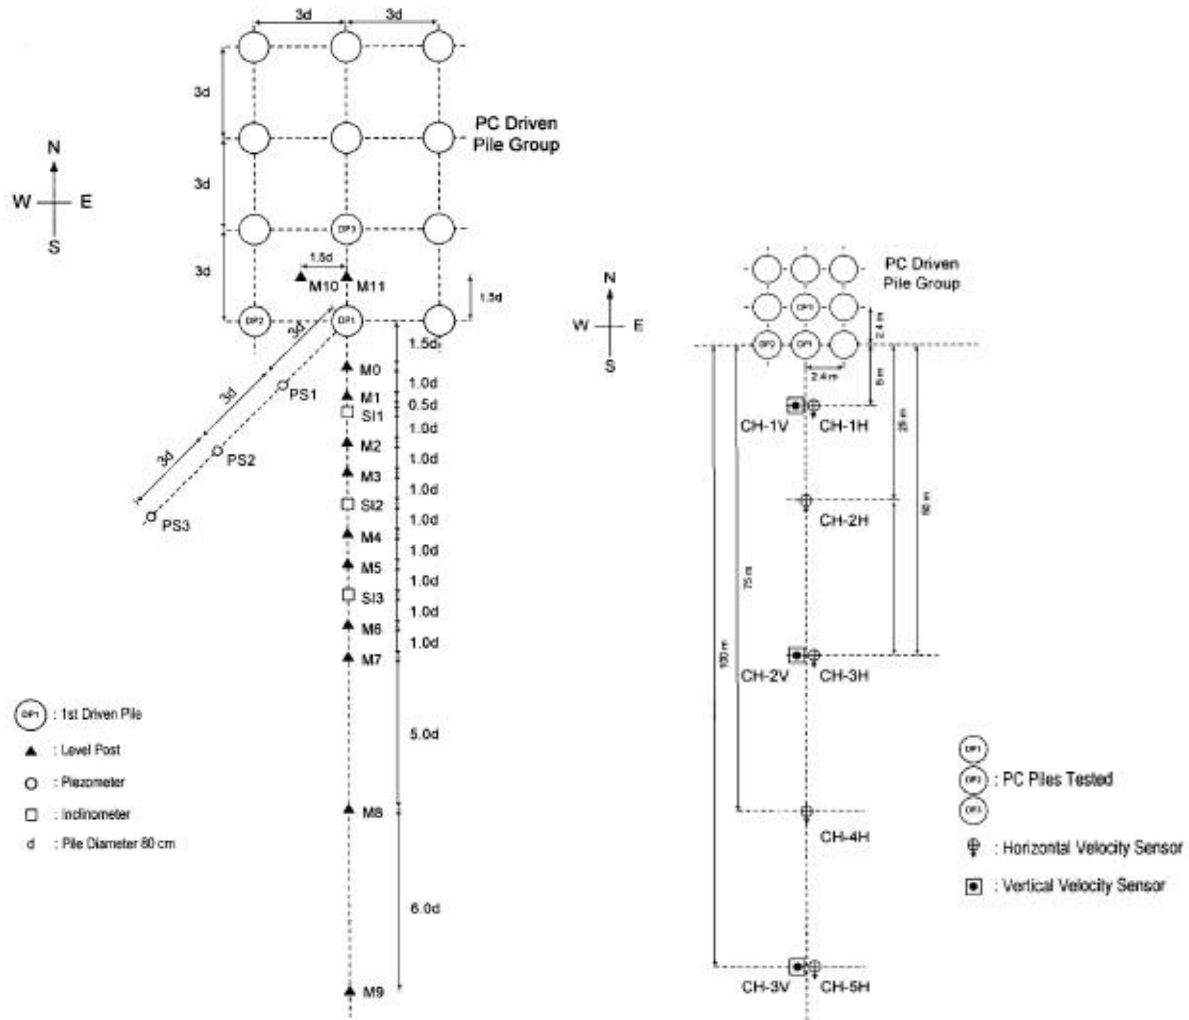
Site plan with arrangement of instruments (from Hwang et al. 2001)
